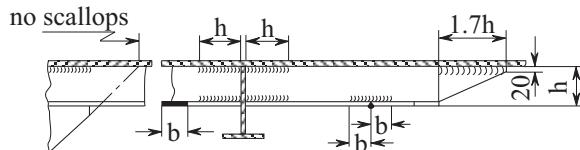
Welds at the ends of girders and stiffeners
